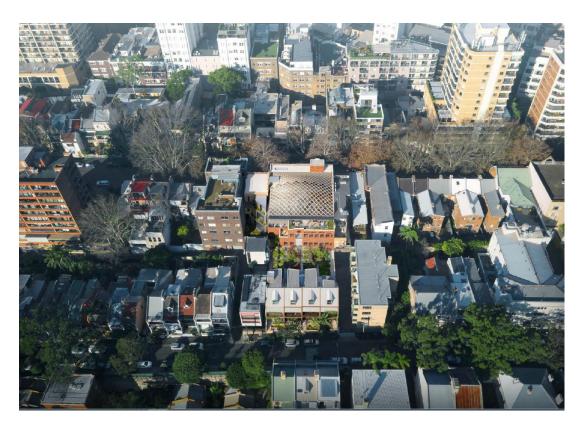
Proposed aerial photomontage drawing extract of the development and surroundings
